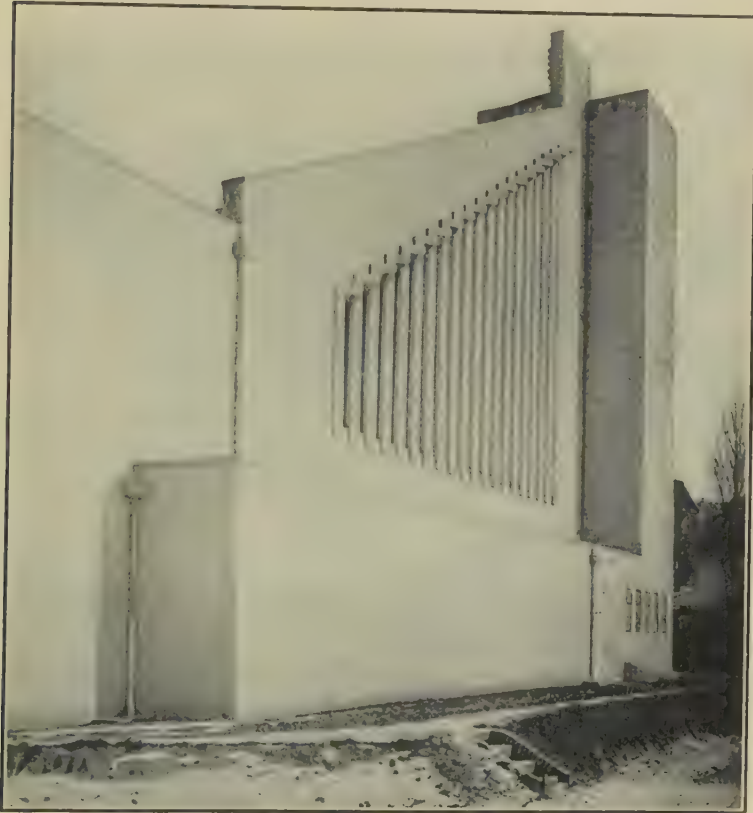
SIDE ELEVATION OF THEOSOPIHICAL SOCIETY BUILDING IN AMSTERDAM.
